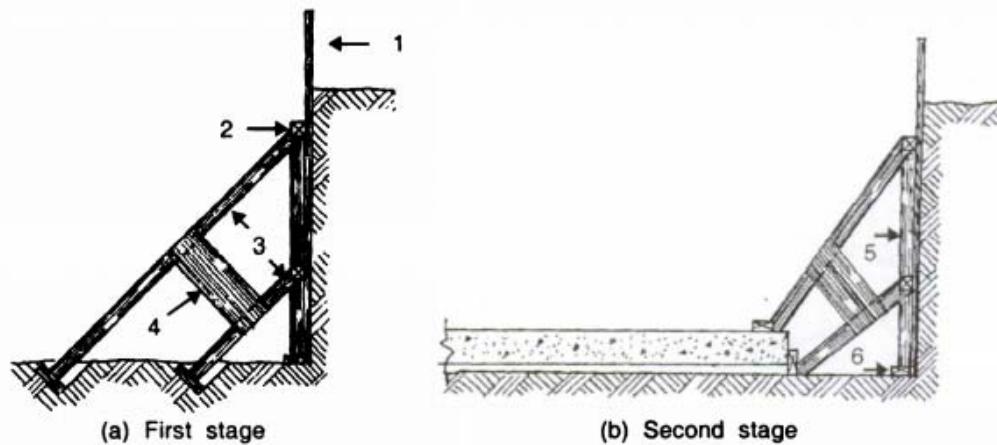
Timber excavation for basements: 1. Vertical face timbering projecting above G.L. for safety of work, 2. Horizontal waling, 3. Raking struts, 4. Binders to struts provided on both sides, 5. Vertical punchions at 2 m centers, 6. Sole plate.
